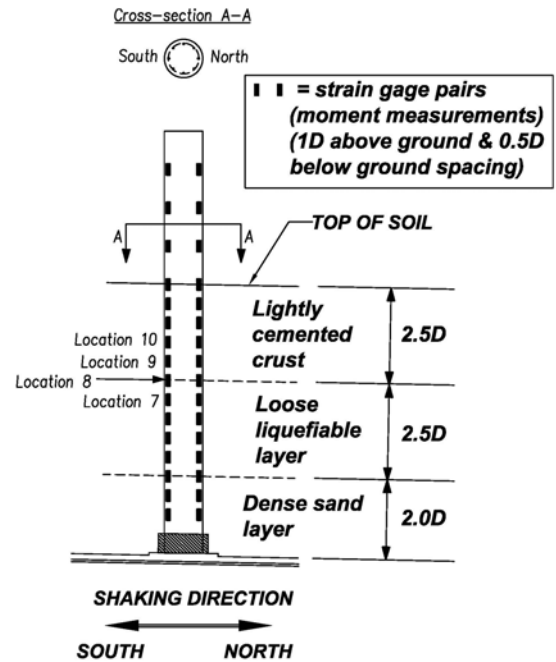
Schematic of strain gages embedded in reinforced concrete pile.
